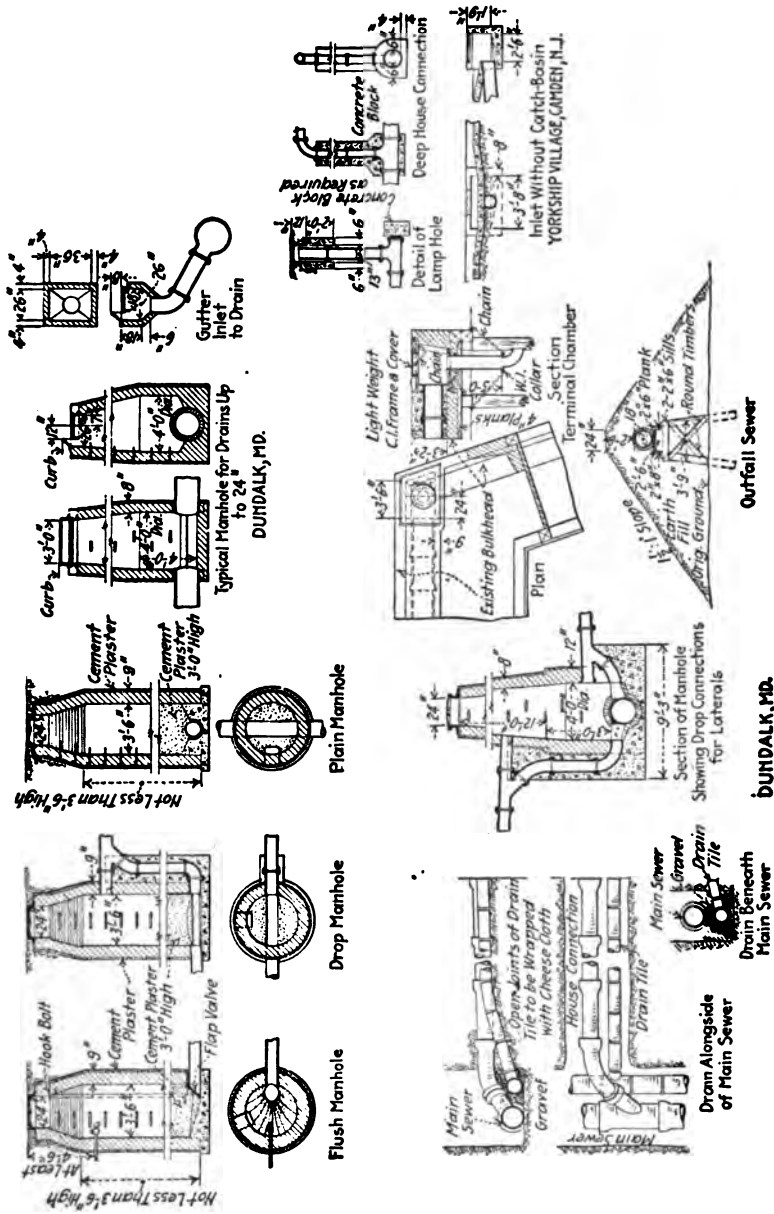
Standard designs and typical details for sewer construction developed by the Engineering Branch of the Division of Passenger Transportation and Housing of the Emergency Fleet Corporation.
